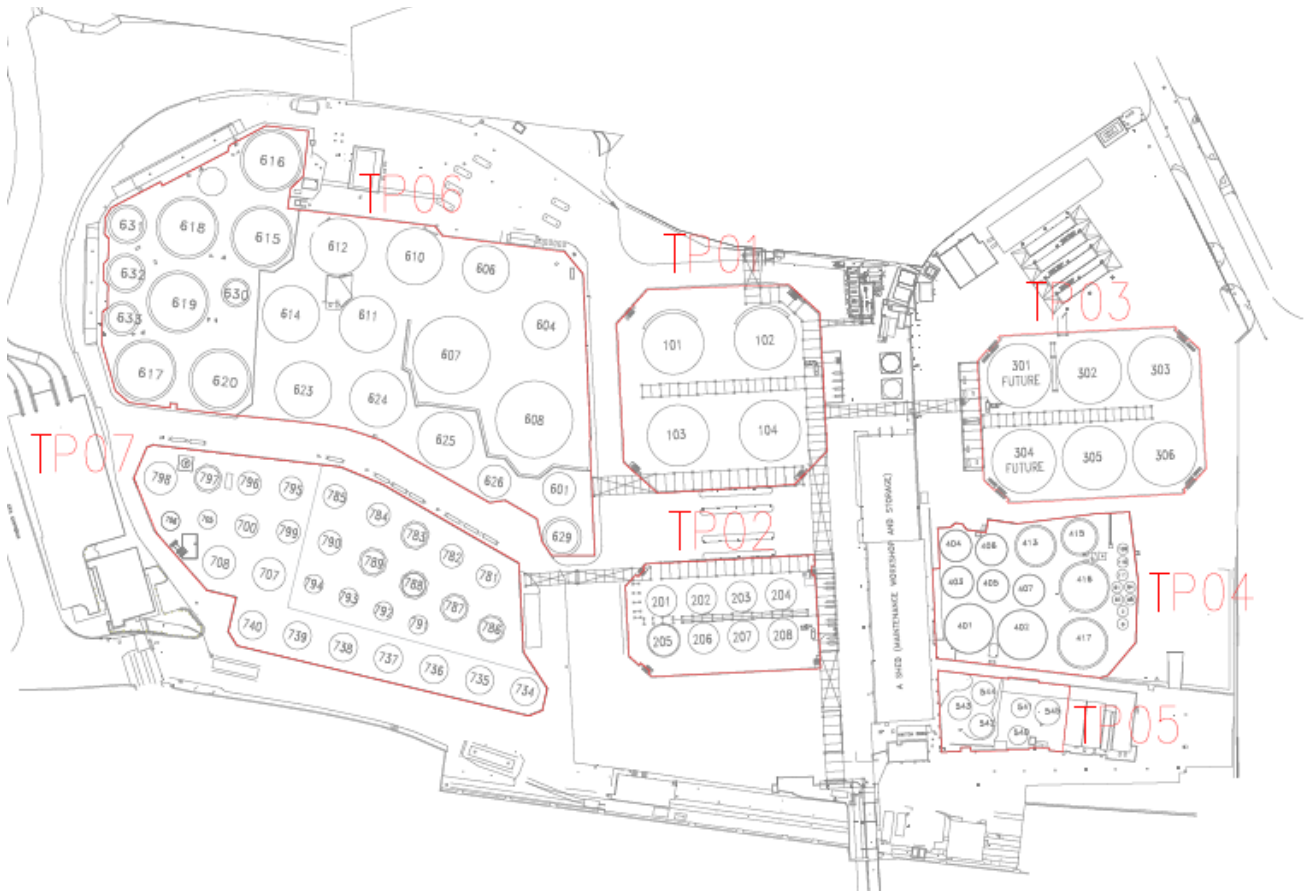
Site Operations Storage Plan (Northwest area of the facility)
